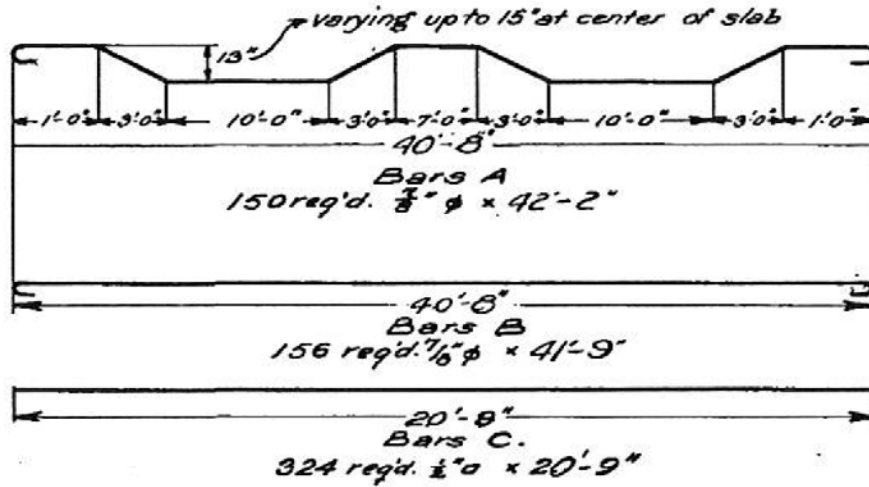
Bar Geometry of Two-Span Continuous Bridge in Fayette Co. from SHDA (1924)
